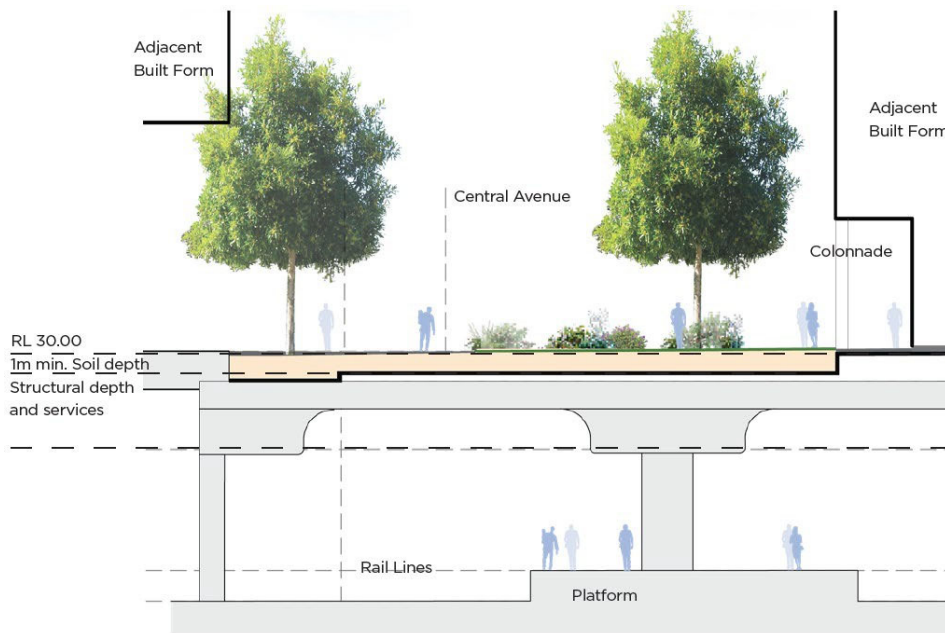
Typical Section through Central Avenue showing deck structure and connected soil depth
